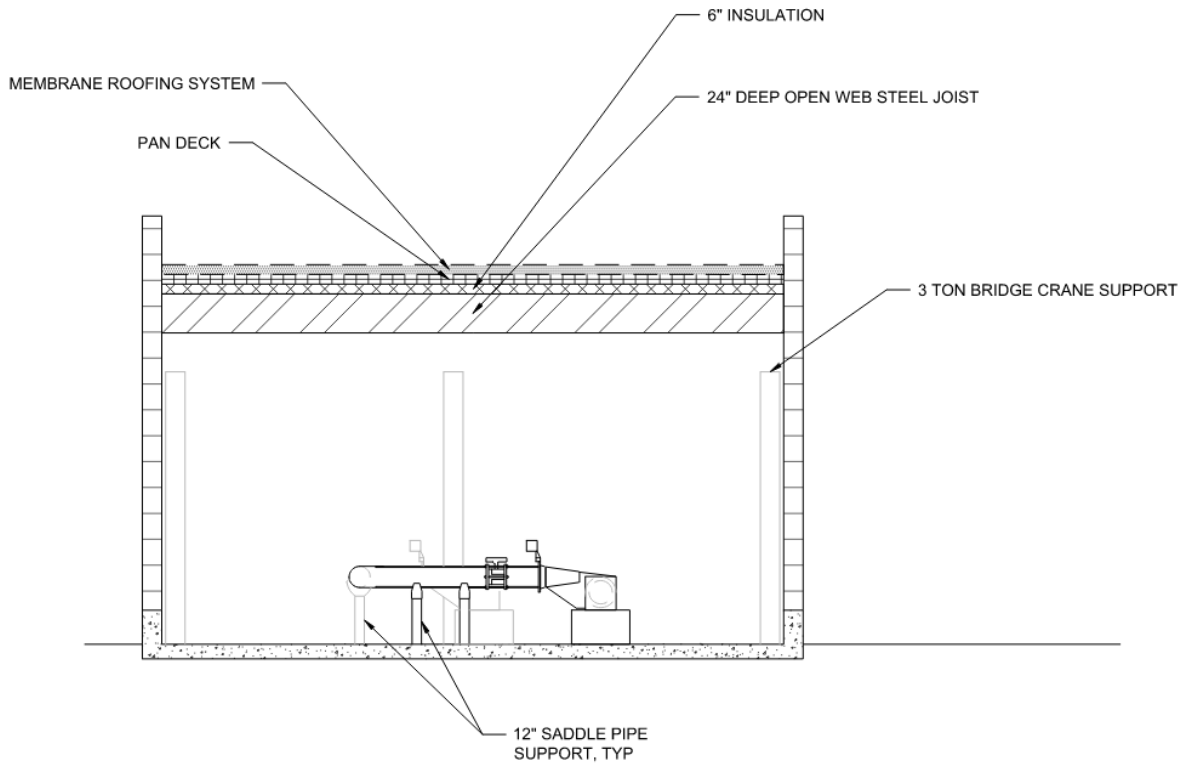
Building Layout of Proposed In-conduit Hydropower Facility, Section A
